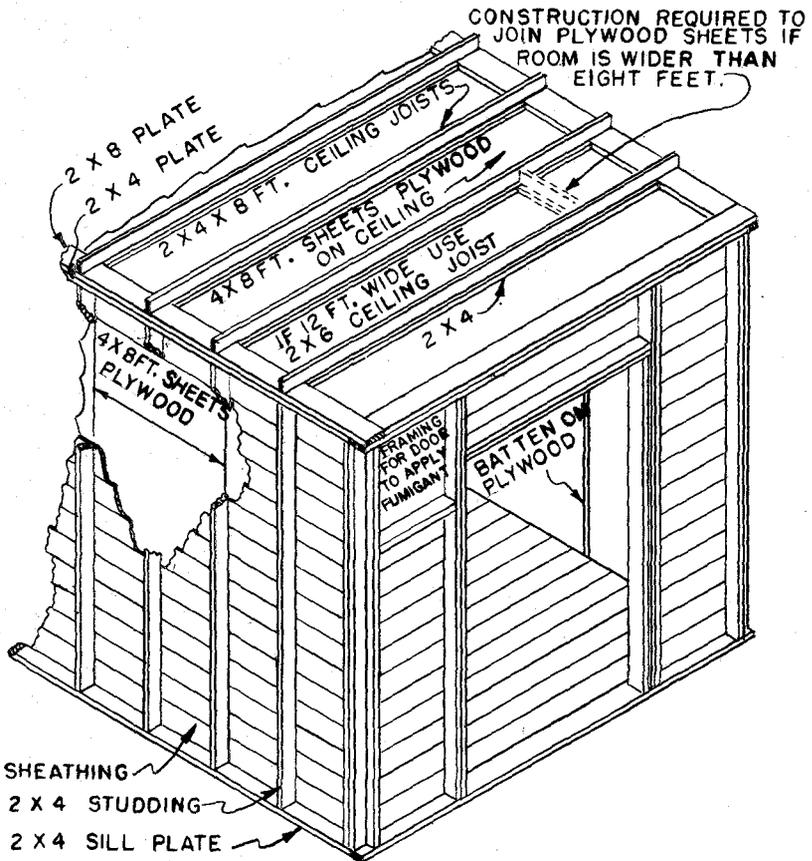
Construction details for the fumigation chamber. Outside dimensions should be planned to allow a minimum of cutting on plywood sheets used as interior lining.
